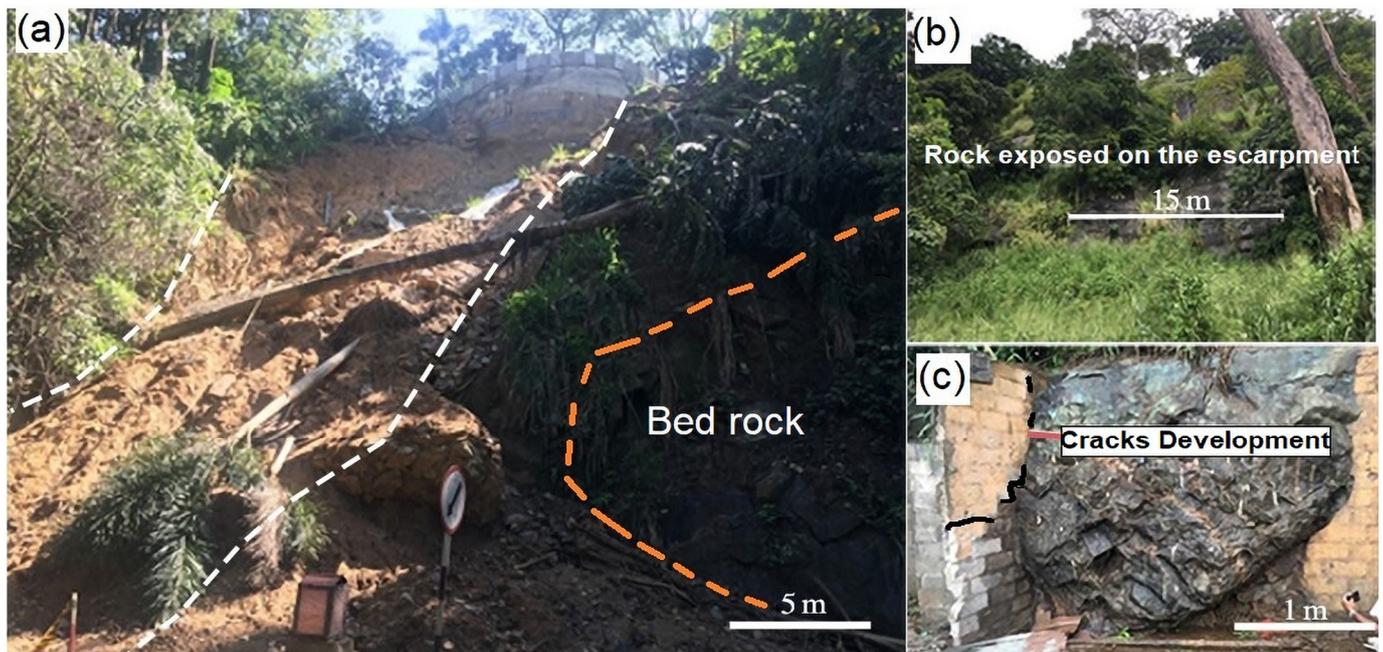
Photographs of (a) the failure area at site 1, revealing a soil mass devoid of rock boulders with large trees in the surroundings; (b) the scarp slope in the crown area of landslides at site 2; and (c) a boulder surrounded by boutique construction (site 2).
